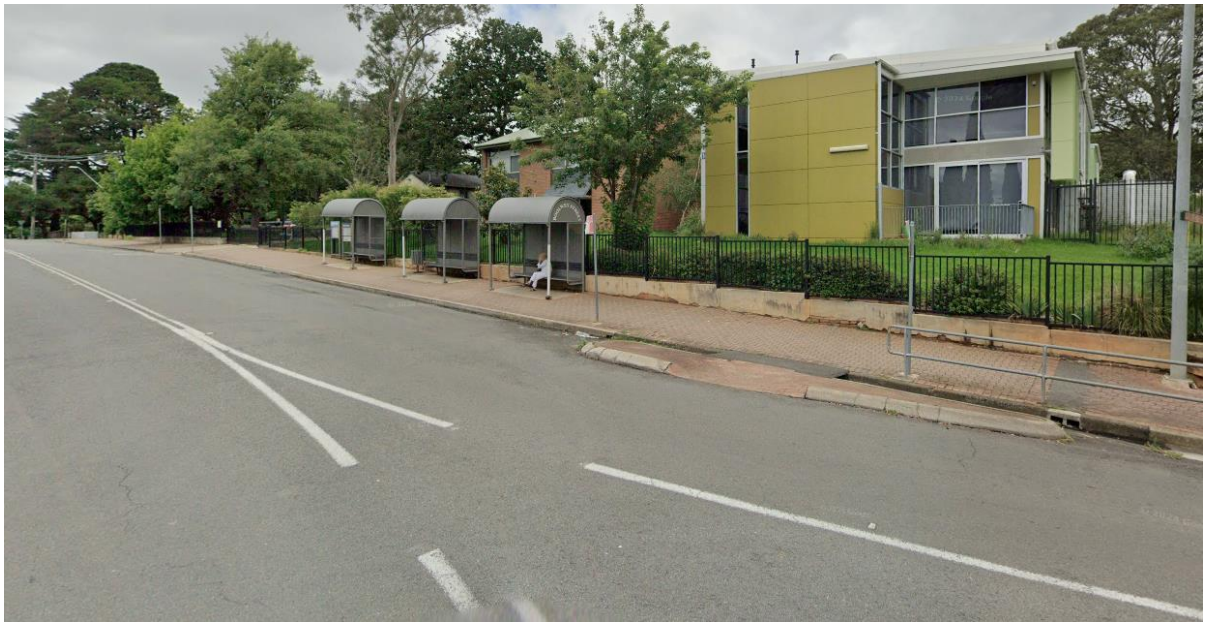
Existing Bus Zone and kerb ramp on south side of Boolwey Street
